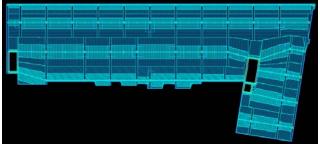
Sixth floor latitudinal and longitudinal design strips accordingly
